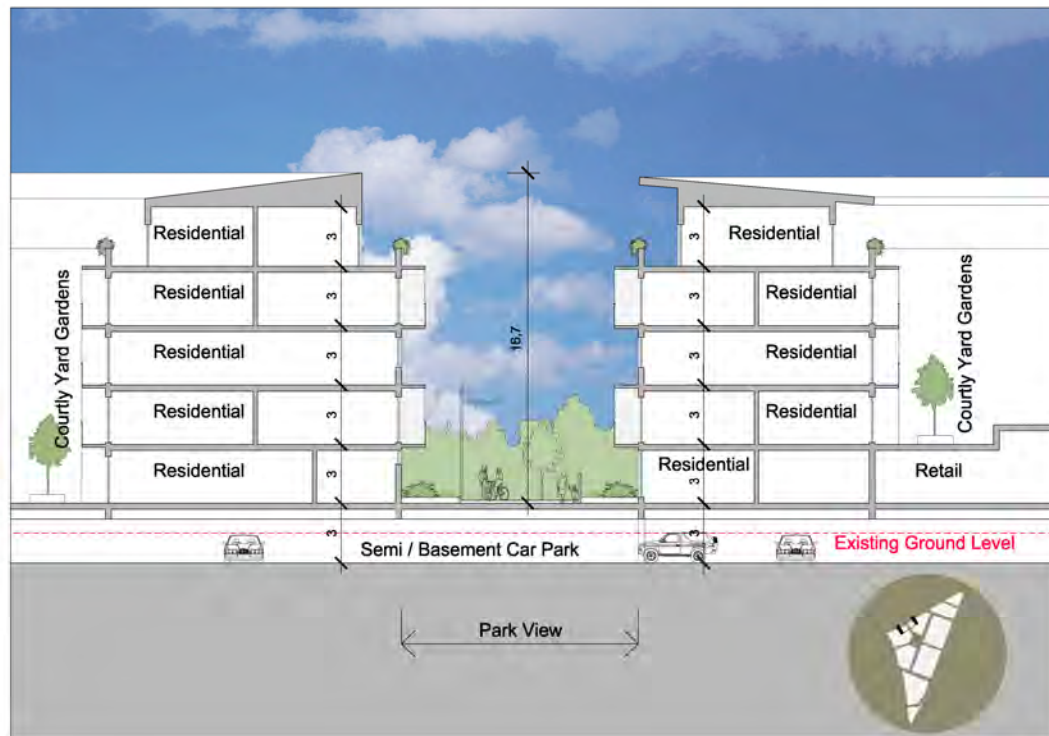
Section showing Homezone between residential blocks, looking towards City Park
